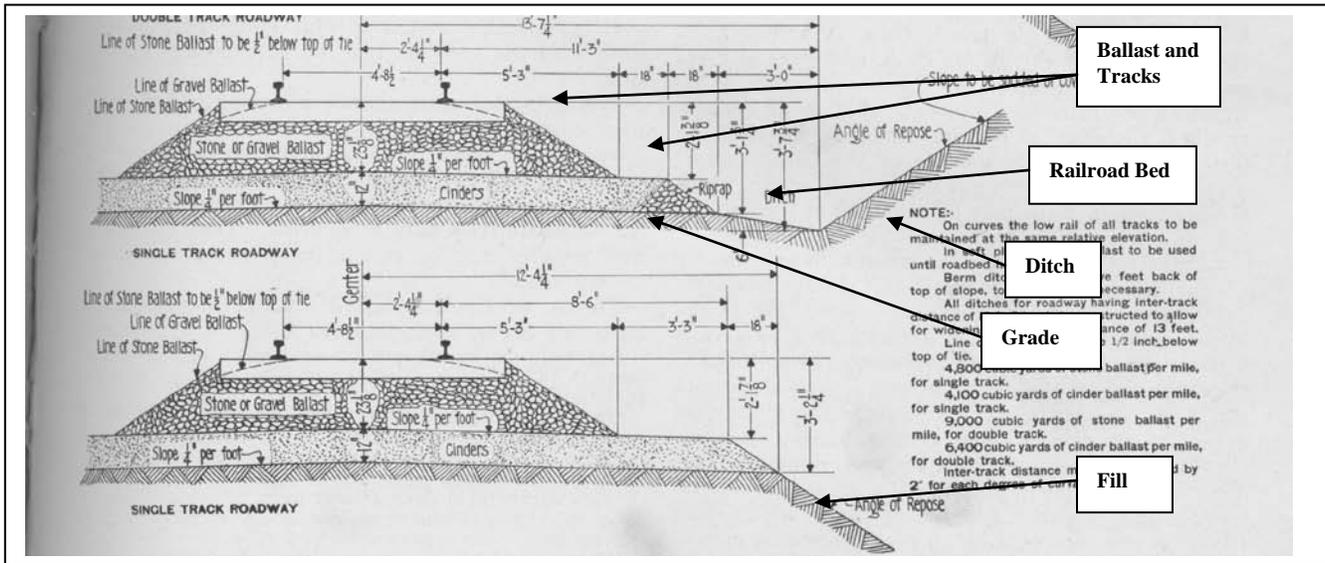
Typical railroad roadway cross section (Howson 1926:95)
